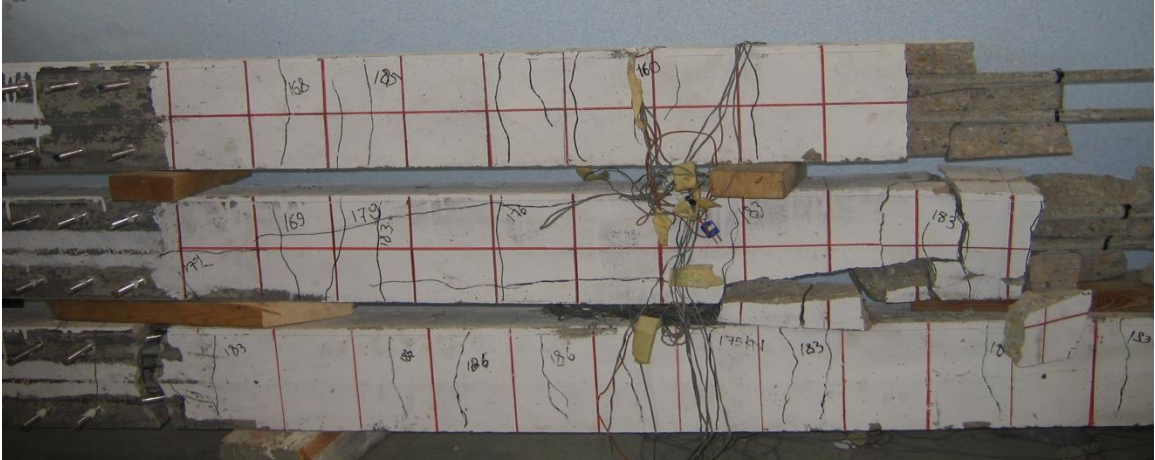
Crack Pattern and Mode of failure of Straps Prestressed at 45%-A
